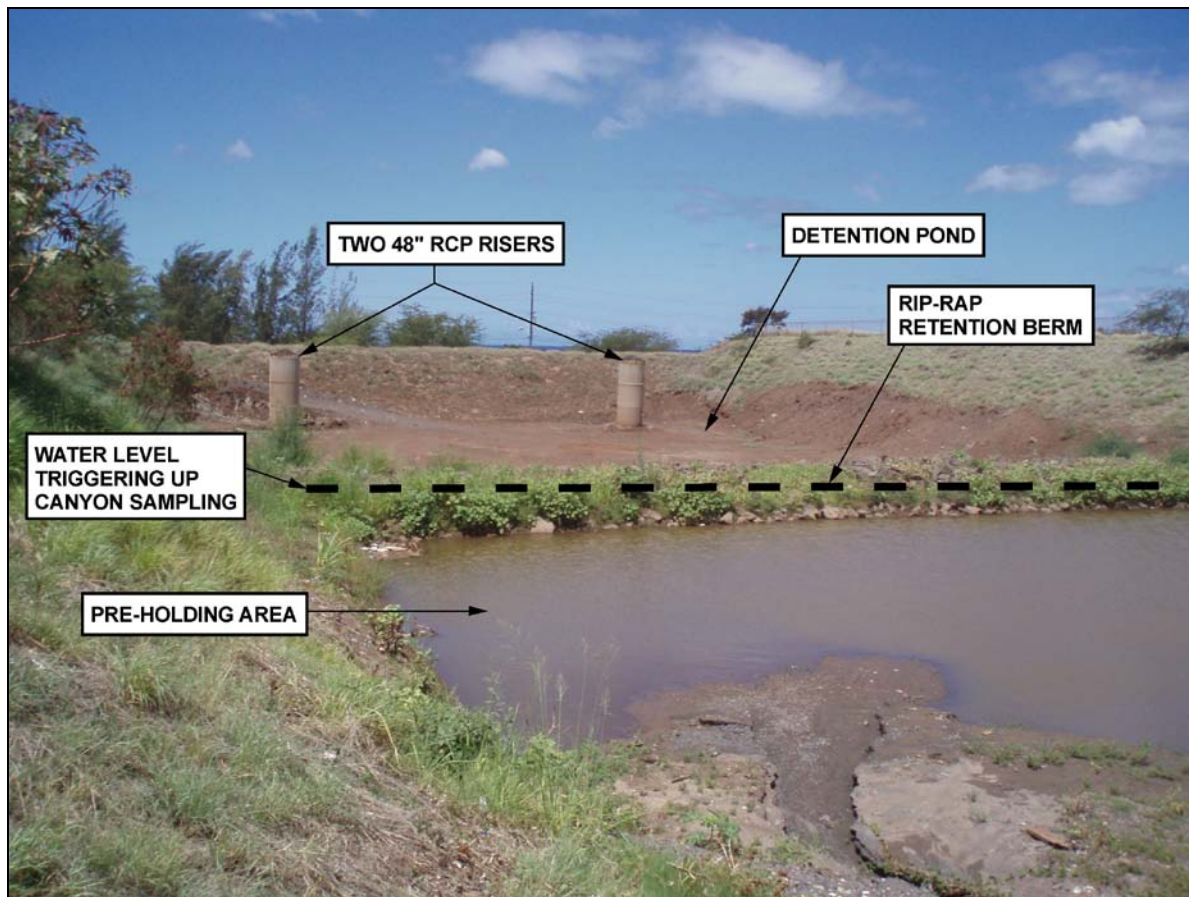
When storm water in the pre-holding area reaches the level indicated above, collection of an up canyon sample should be attempted.
